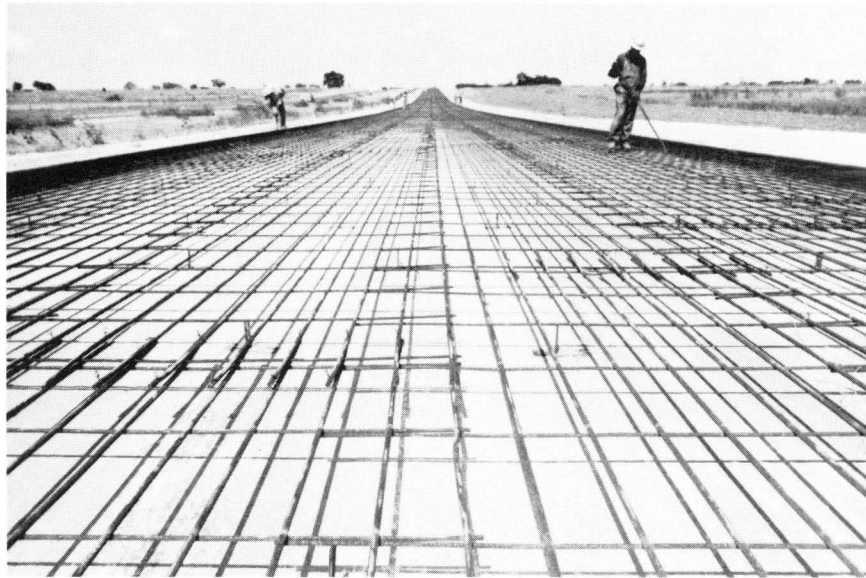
STRETCH OF WELDED WIRE FABRIC SUPPORTED ON CHAIRS AND READY FOR CONCRETE PLACEMENT.
